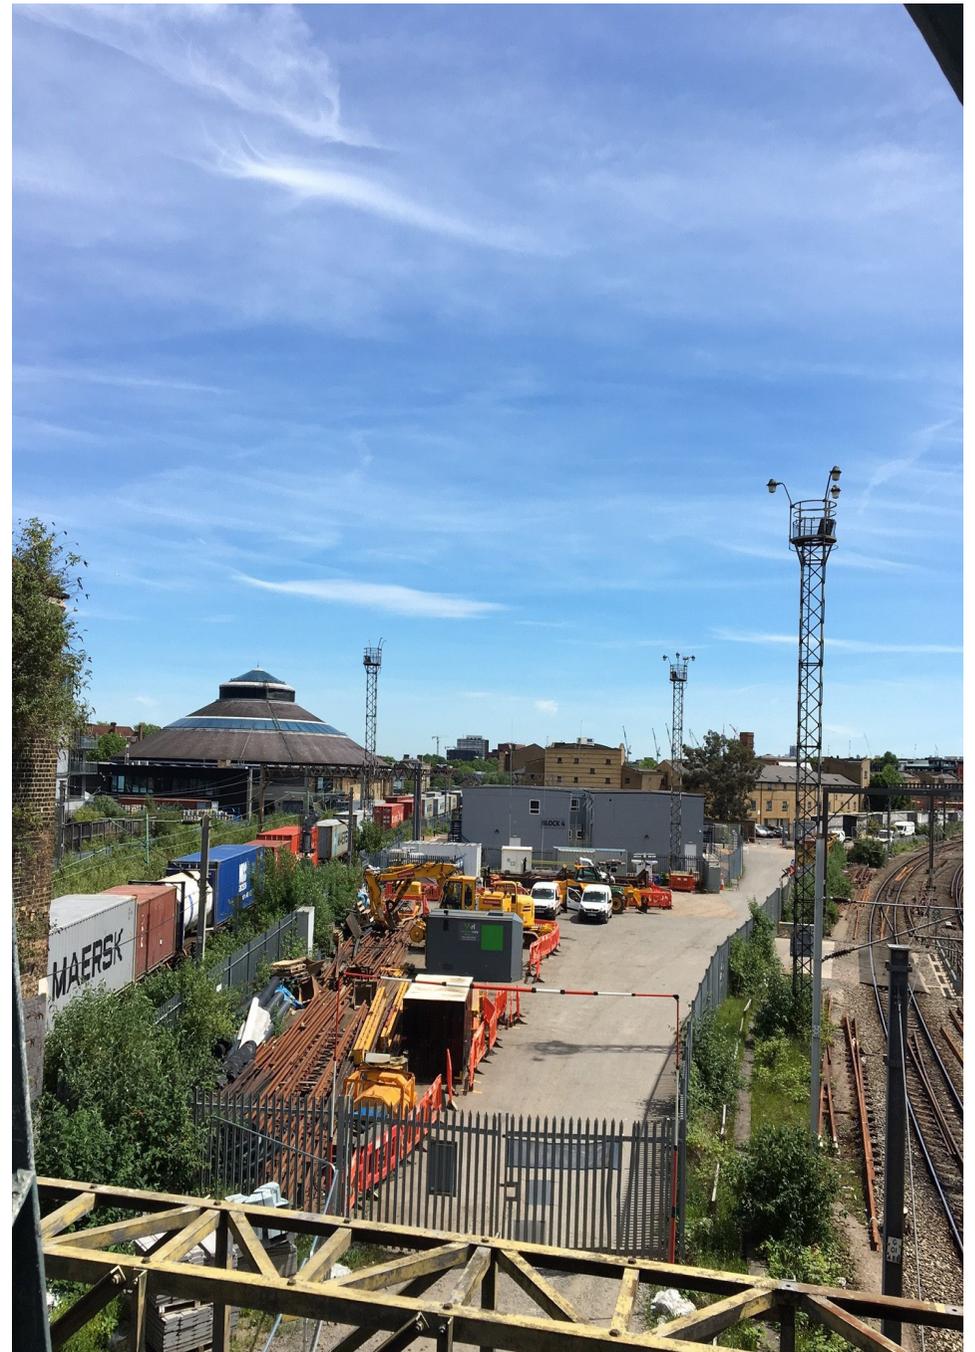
CGY6 - Network Rail Site at Juniper Crescent
